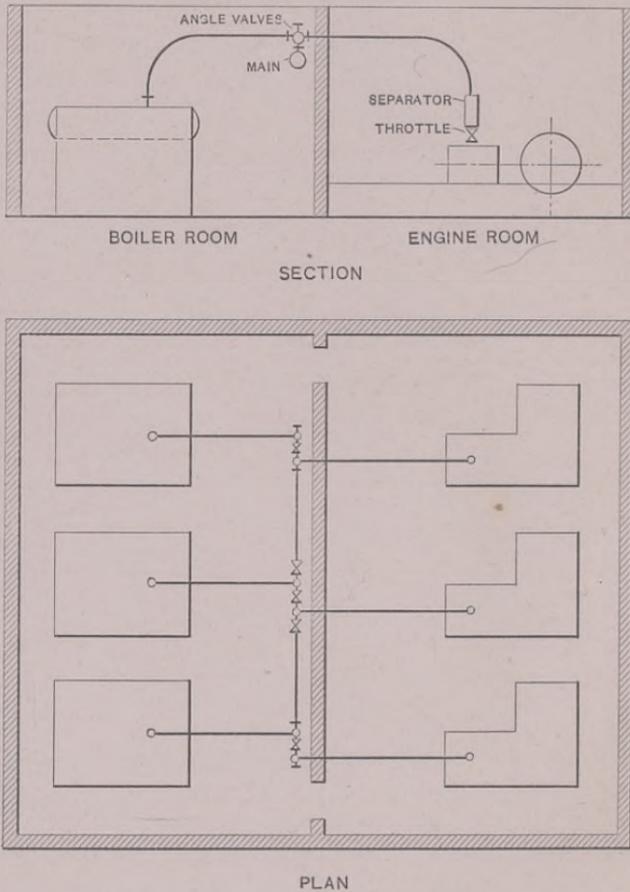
Power Plant with Arrangement Similar to Fig. 29, but with Different Piping Plan.
